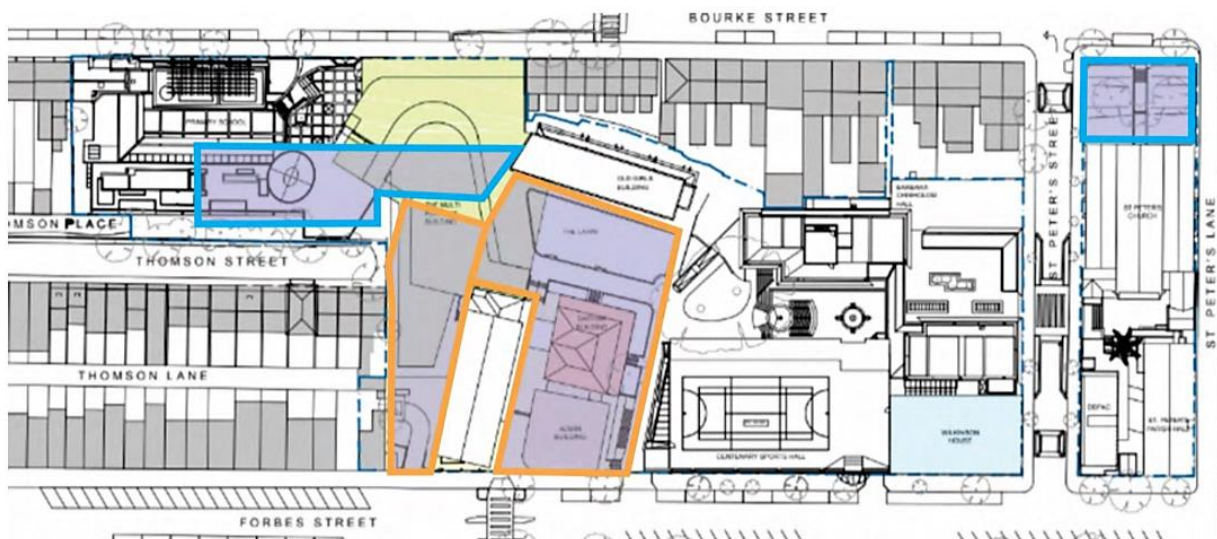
Overlay of the 19th century Barham Estate (orange) and the rear yards of the terrace buildings off Bourke Street (blue) on masterplan
